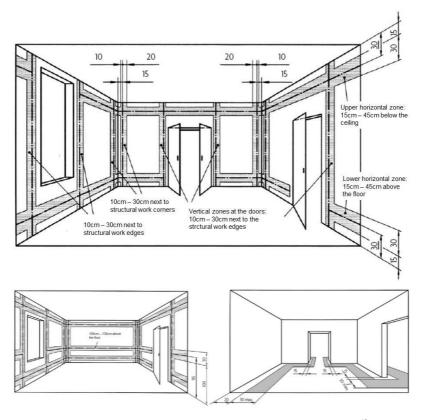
Vertical and horizontal wiring conduit zones in residential buildings¹⁵
